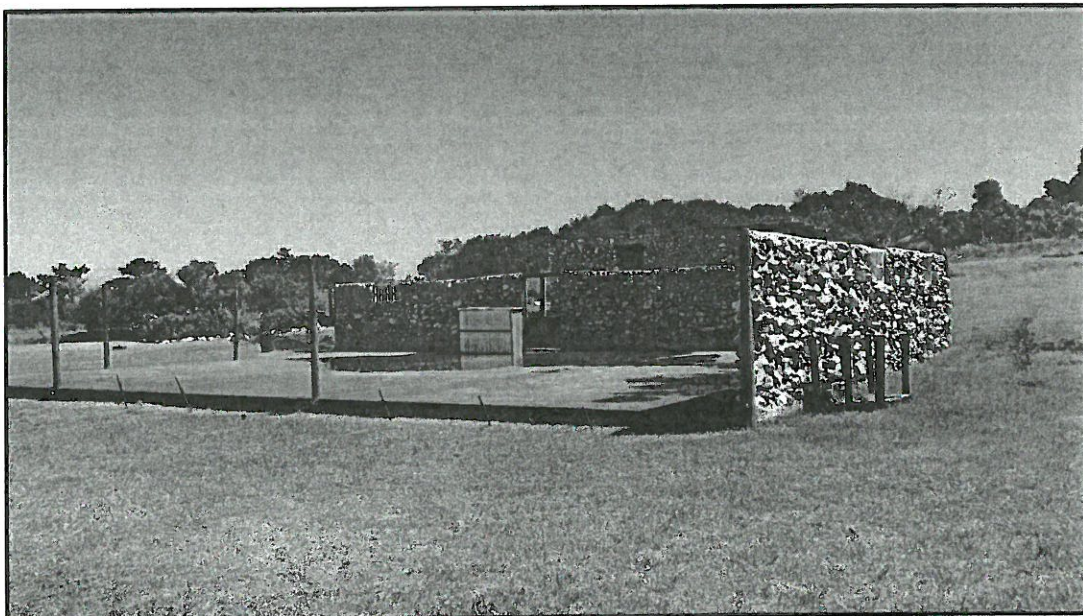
Proposed venue/place of entertainment (existing concrete slab).
